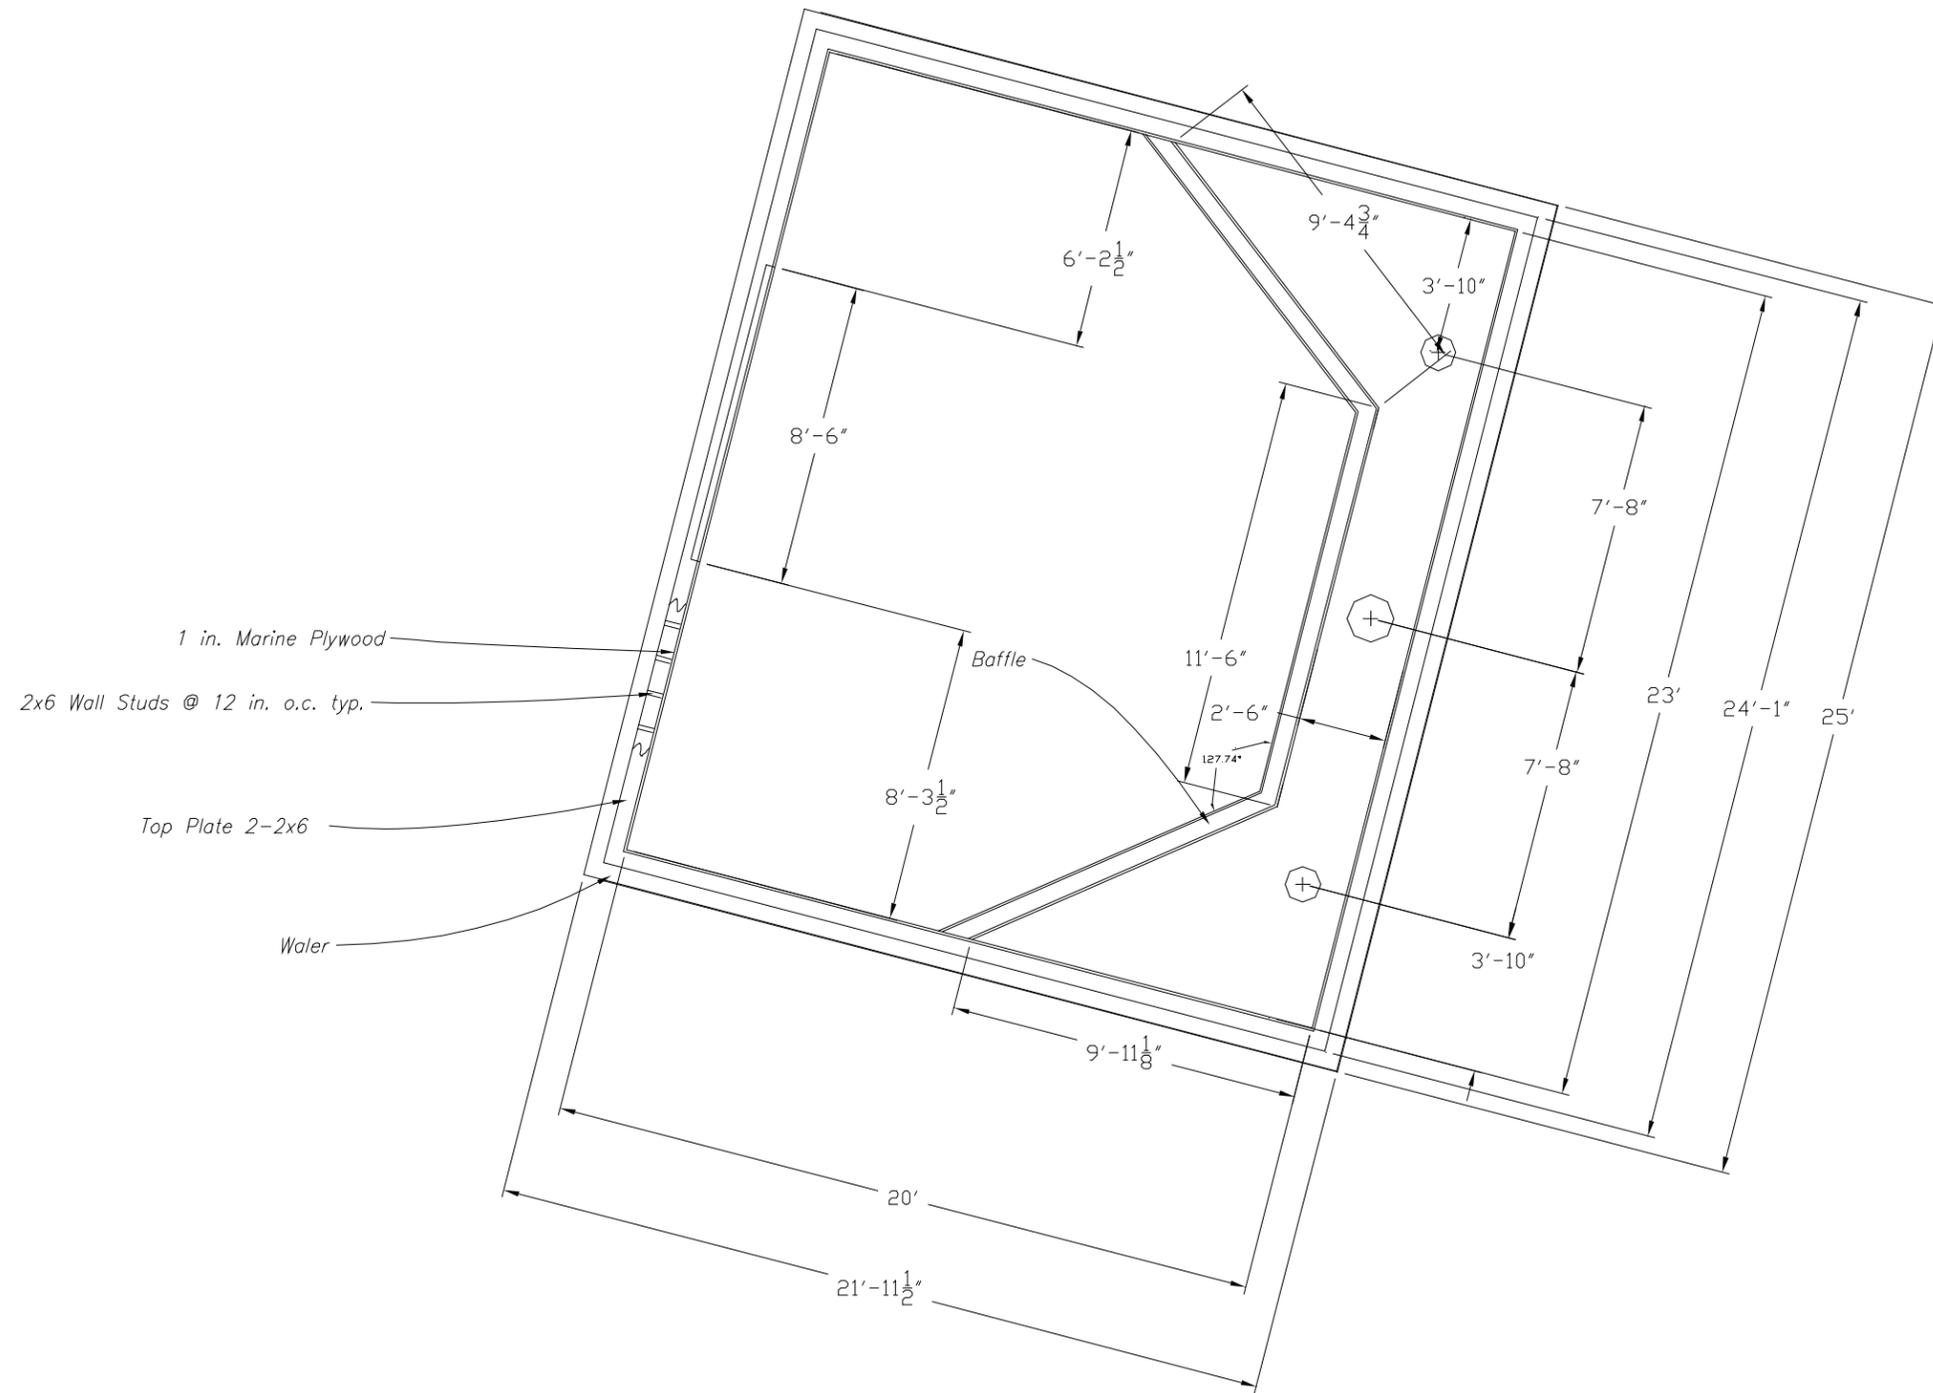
Model construction drawing: Plan view of main dam headbox with inlet pipes, rock baffle, and spillway cut-out.
